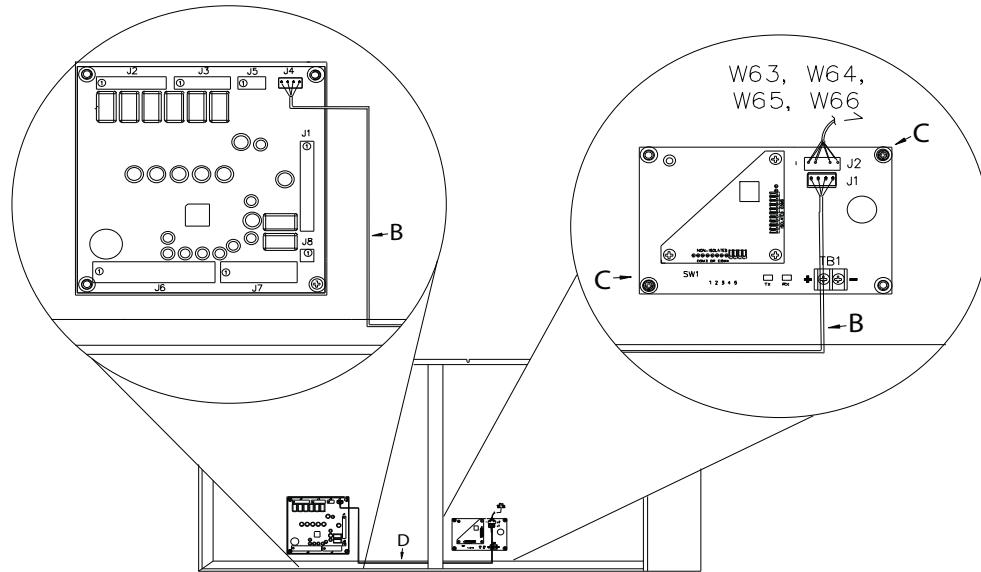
TCI Board Mounting and Wiring 12 1/2 - 25 Ton packaged rooftop units
